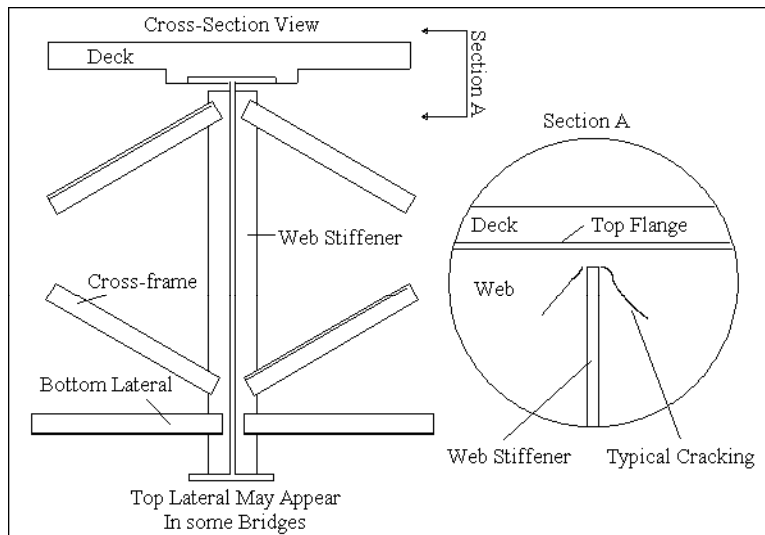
Typical Web Cracking at Diaphragm Connections
